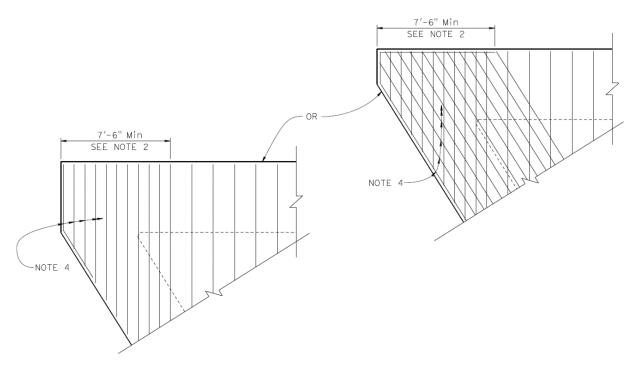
Skewed Deck Corner Reinforcement (Over 20° Skews)
